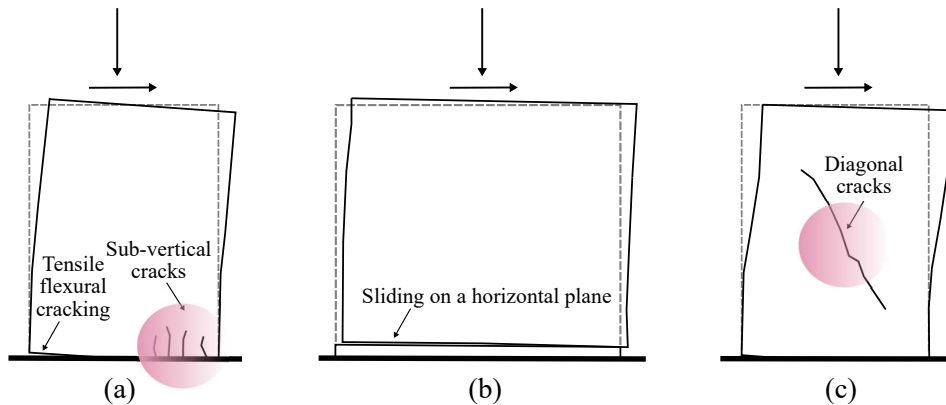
Typical failure modes of masonry walls: (a) rocking; (b) sliding shear failure; and (c) diagonal cracking (adapted from [Calderini et al. \(2009\)](#)).
